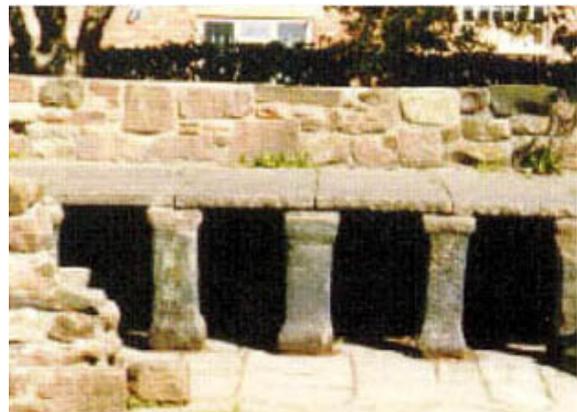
raised floor on stump walls with gaping openings for cross-ventilation
